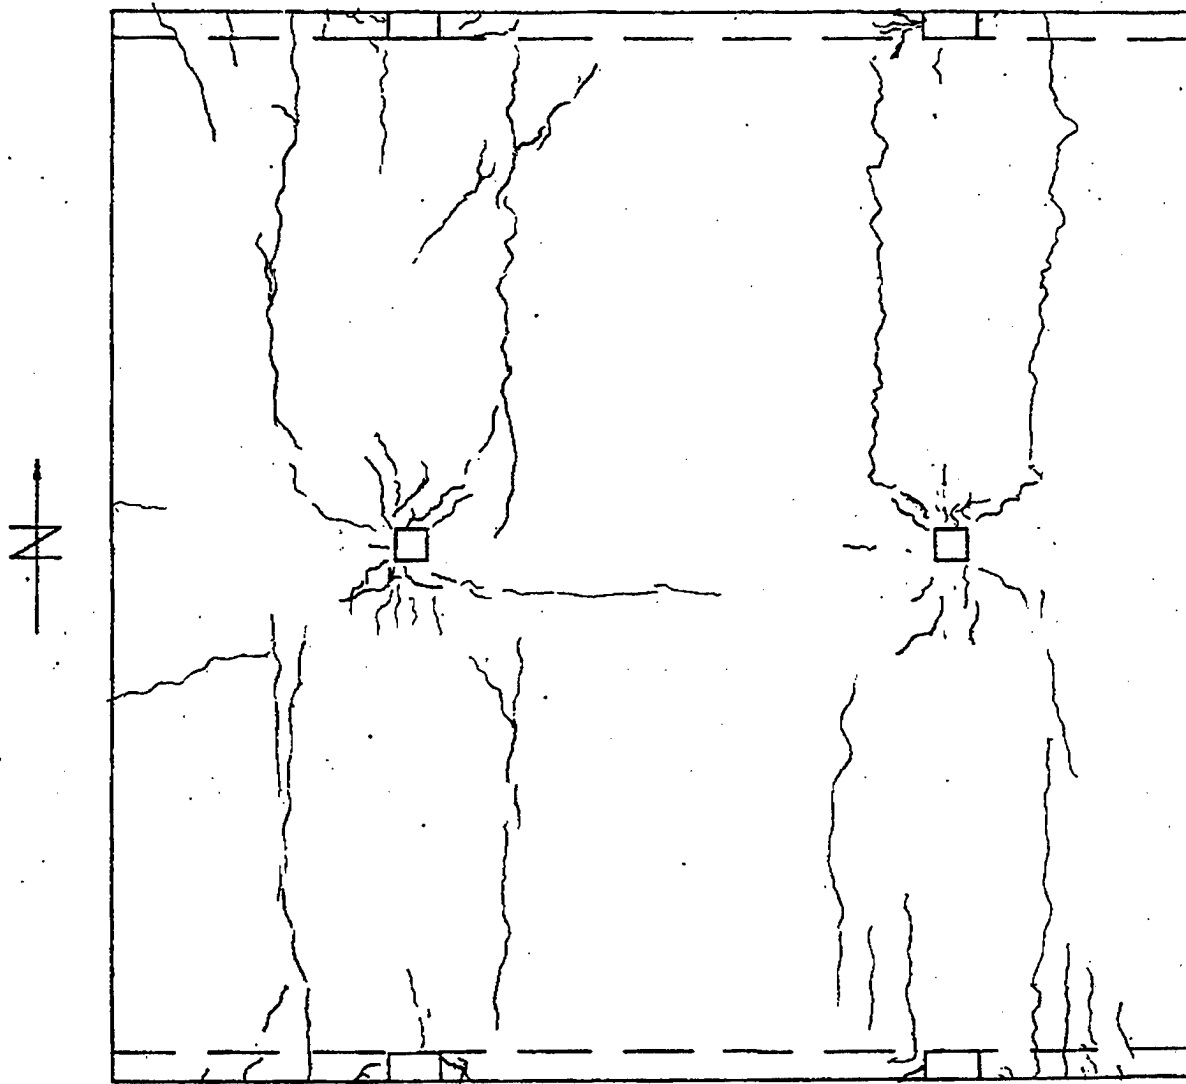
Crack Pattern, First Floor Slab, Top Side, Post-E200N
